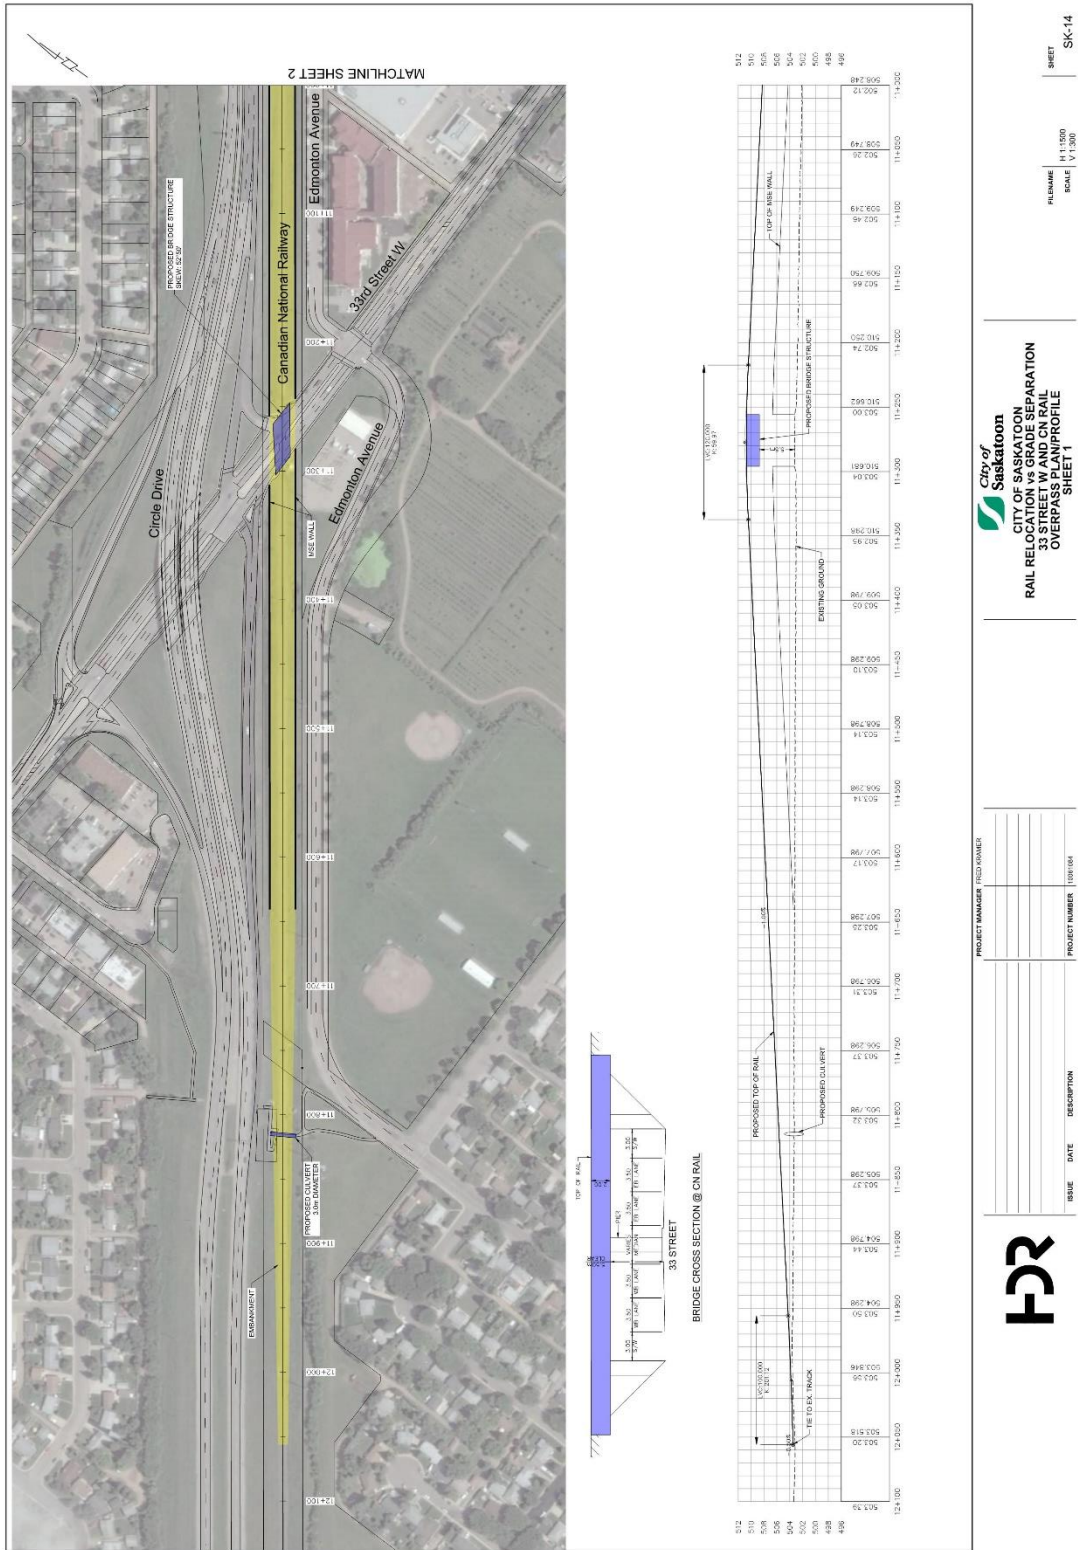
Proposed Conceptual Plan and Profile for 33rd Street W @ CN
